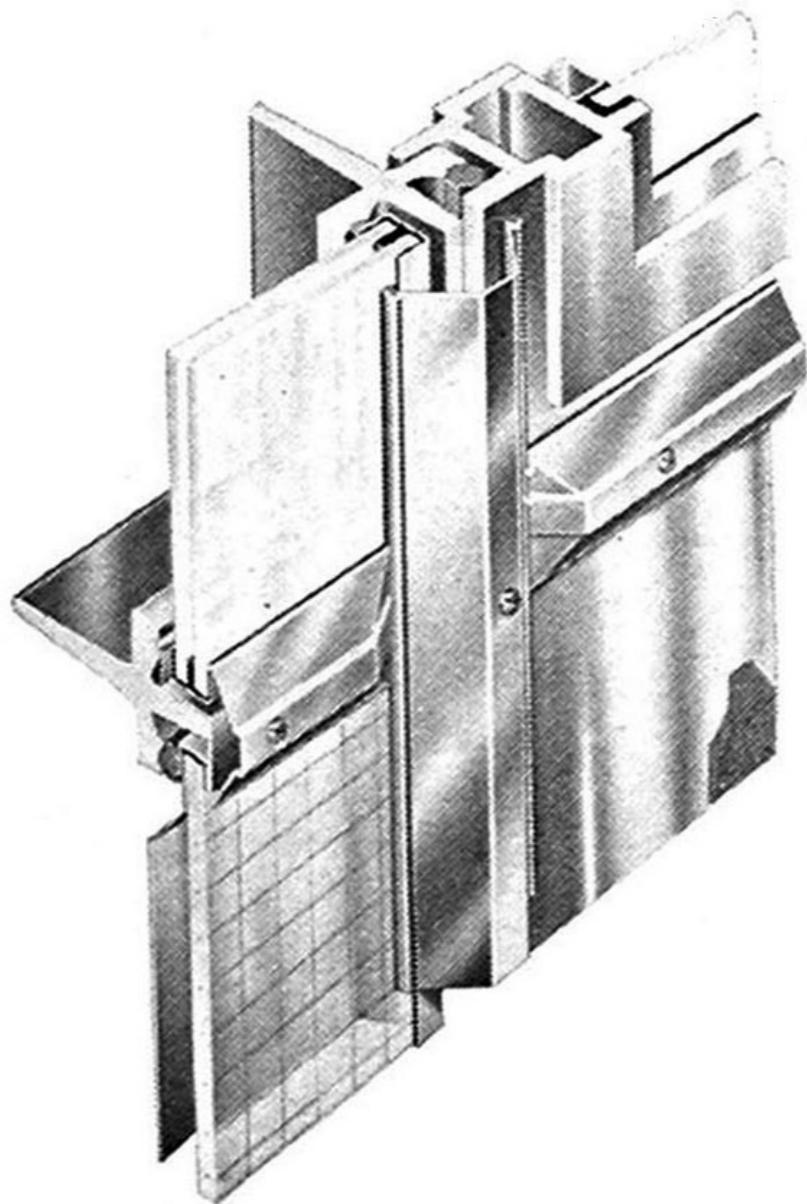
Isometric detail of the original 'Hills' system. Note that this drawing shows a double-glazed unit. It should be noted however that all glazing at Ashmount School is single thickness.
